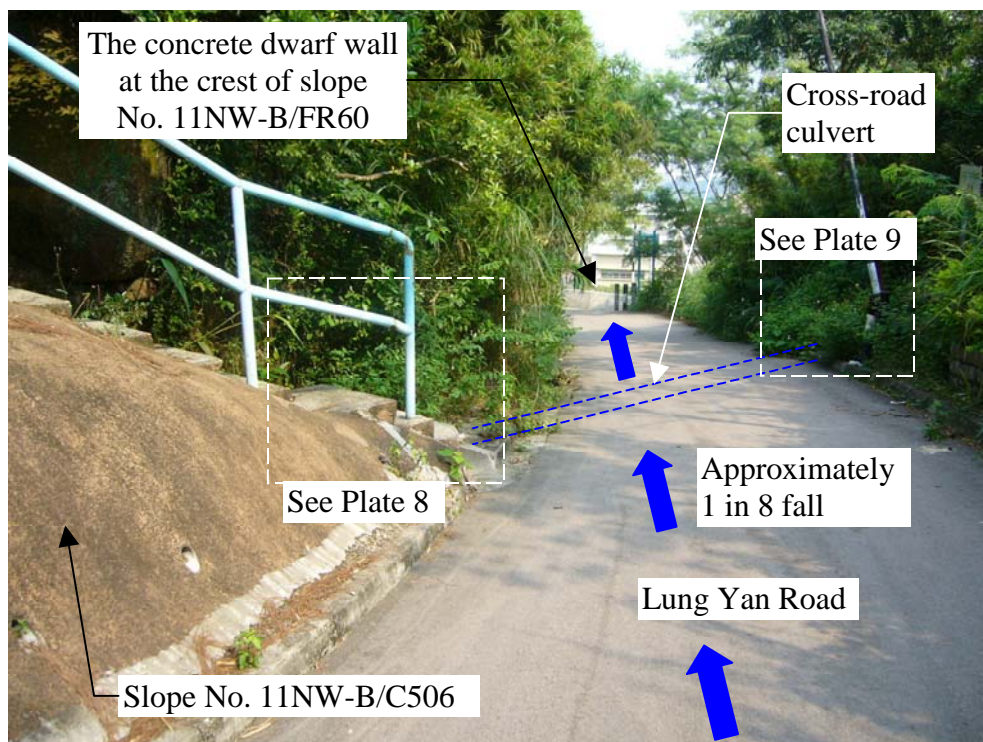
View of Lung Yan Road Running towards Erosion Scar at the Northwest Corner of Slope No. 11NW-B/FR60 (Photograph taken on 20 September 2006)
